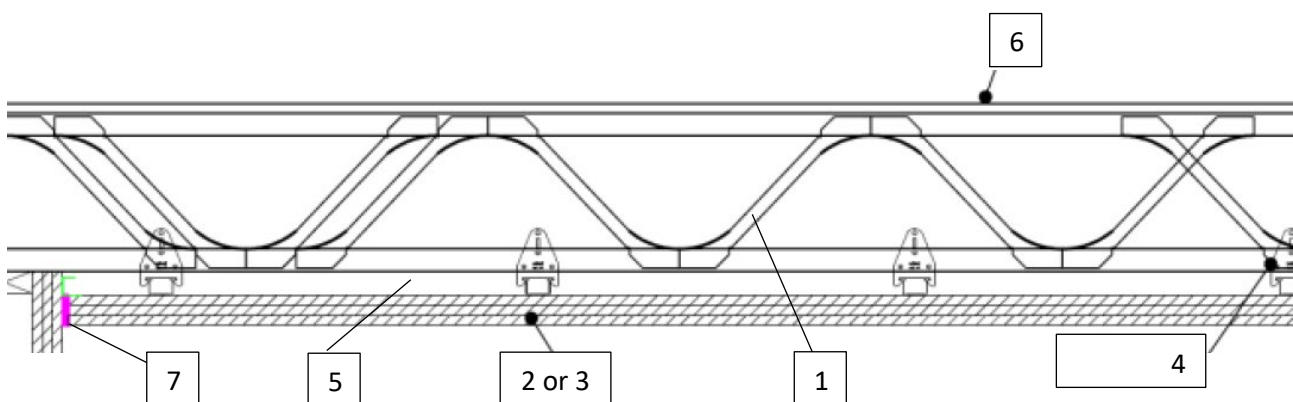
Floor-ceiling system without a false ceiling (Elevation view) showing MiTek Joist, other joist systems as per Table 1 item 1 are similarly arranged
